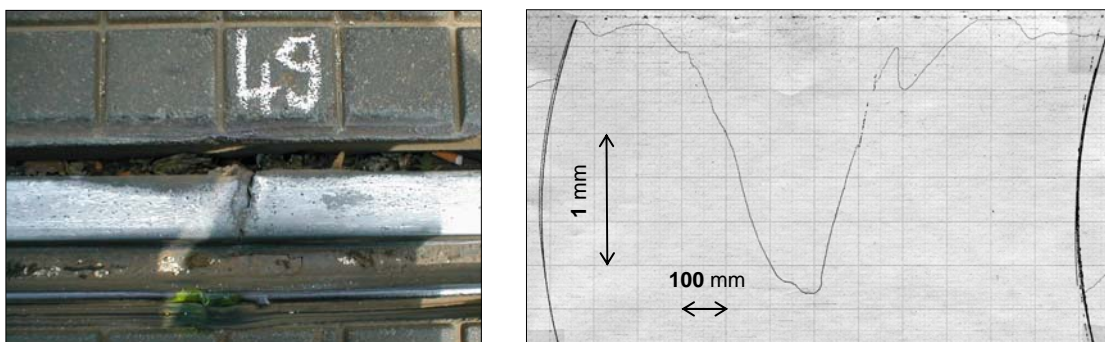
Photograph of the weld and vertical weld geometry
